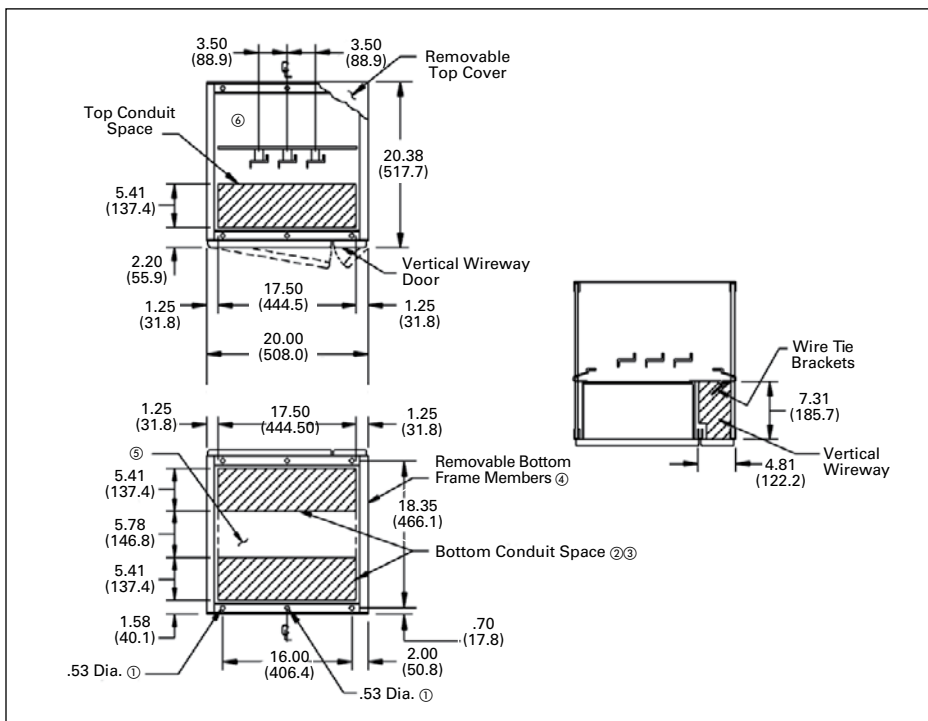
20.00 Inches (508.0 mm) Wide, 21.00 Inches (533.4 mm)—Deep-Front Mounted Only (FMO)
